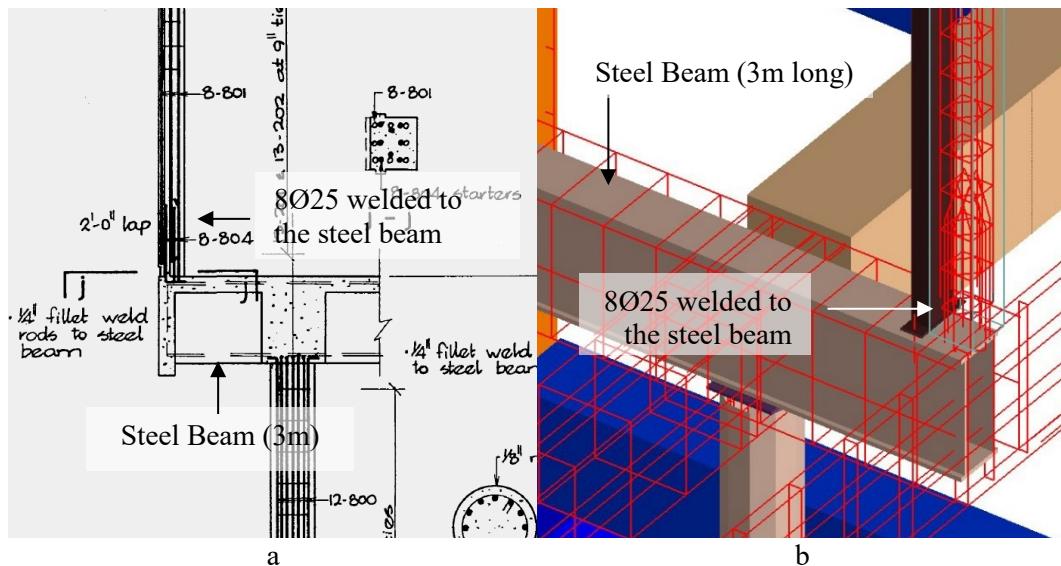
Steel beams enclosed in the concrete girder, original drawings (a) and numerical model (b).
